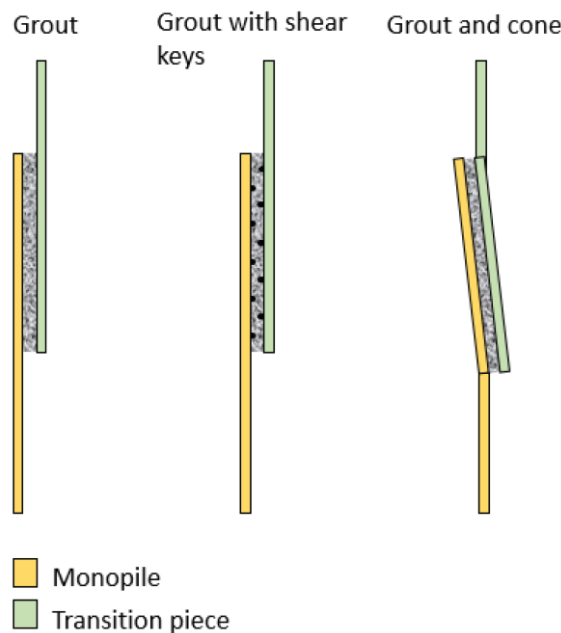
Grouted connection design: Grouted connection, Grouted connection with shear keys and Conical grouted connection[19]
